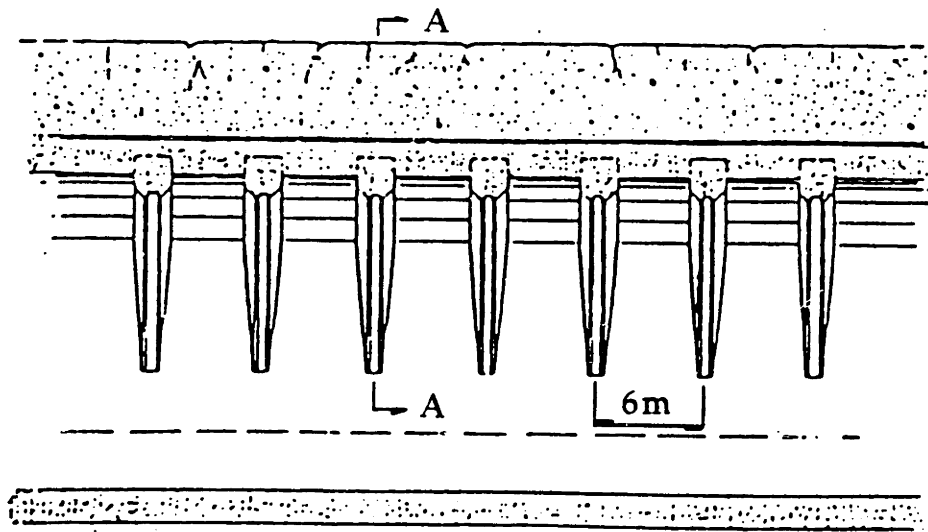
Cross and longitudinal sections: Venezia Station (Lunardi, 1990)
